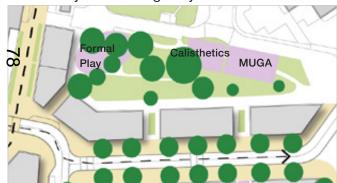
Jubilee Gardens plan – Children's and youth play space
